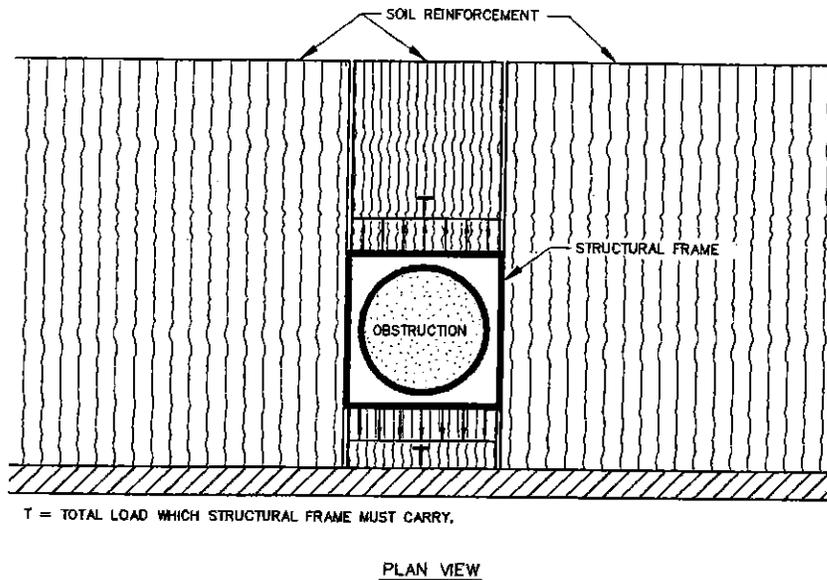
Structural Connection of Soil Reinforcement Around Backfill Obstructions.
